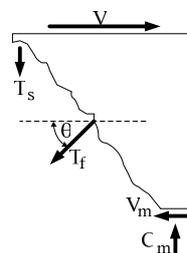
Free body horizontal equilibrium of a wall subject to shear
